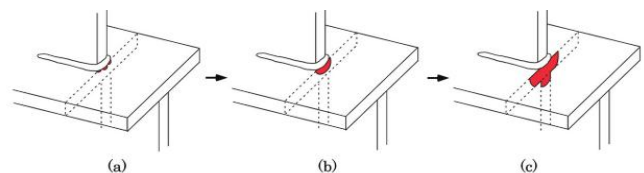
Behavior of fatigue cracks in welded joints. (a) Initiation of cracks, (b) Propagation and coalescence of surface cracks, (c) Propagation of a through-the-thickness crack
